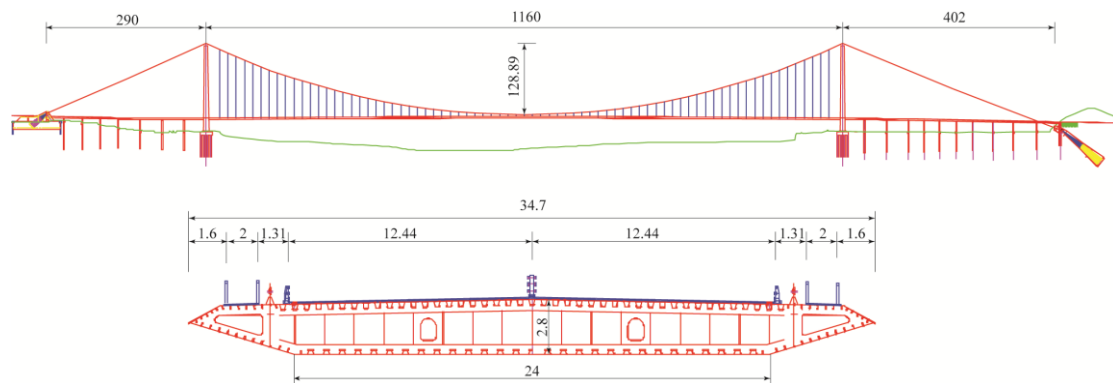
Arrangement of the bridge span and the bridge deck cross section (unit: m)
